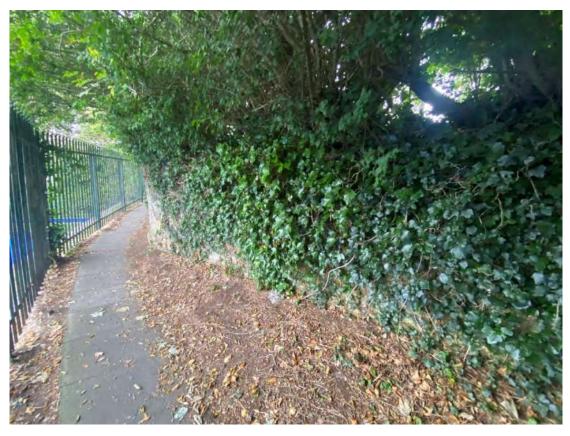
Curving boundary wall at northwest of graveyard, facing east
